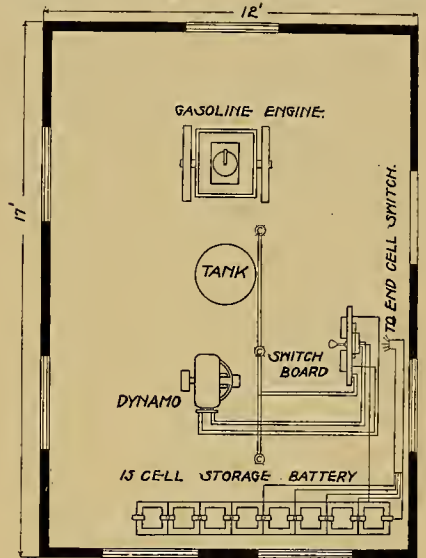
LAYOUT OF ENGINE AND ELECTRICAL EQUIPMENT
